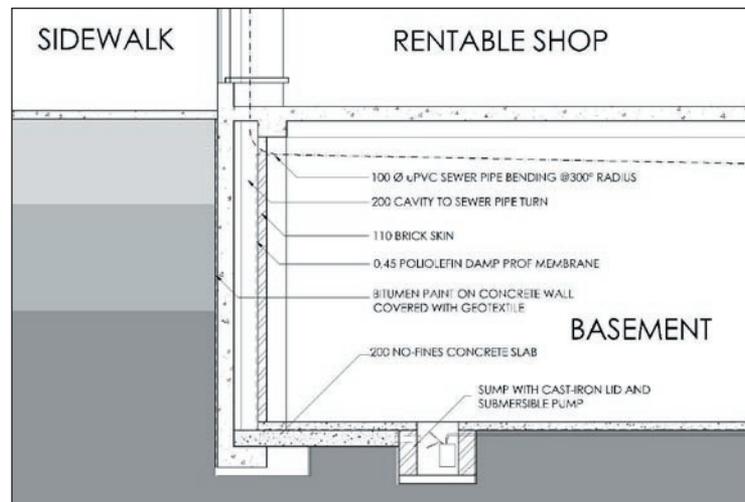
Section through basement edge - Informed by Drained system detail in (WEGELIN, 2000: 26)
